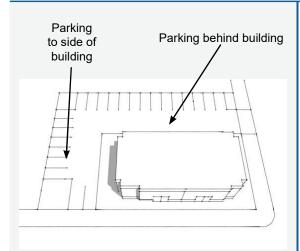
Parking Lot Placement. Parking areas should be placed to the side or back of the building.
